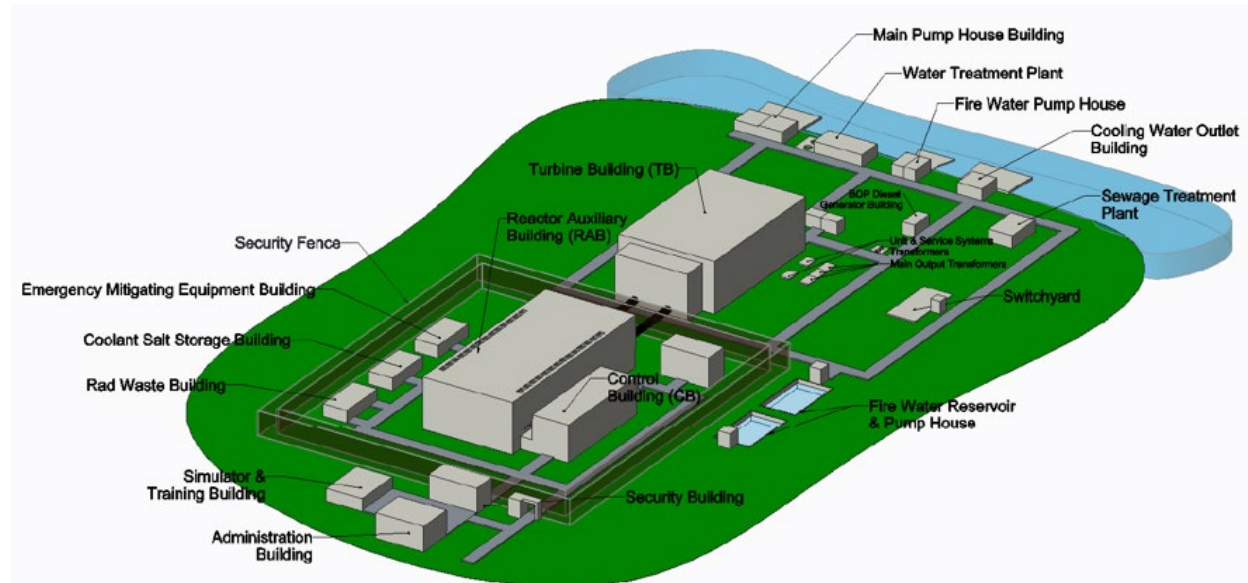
above represents a simplified plant layout identifying the arrangement and configuration of the major buildings, structures, and boundaries of an I-NPP site. A “generic design site envelope,” is used to develop the IMSR® site design and encompasses generic site parameters used in Canada, the U.S. and European countries relevant to nuclear plant siting.
